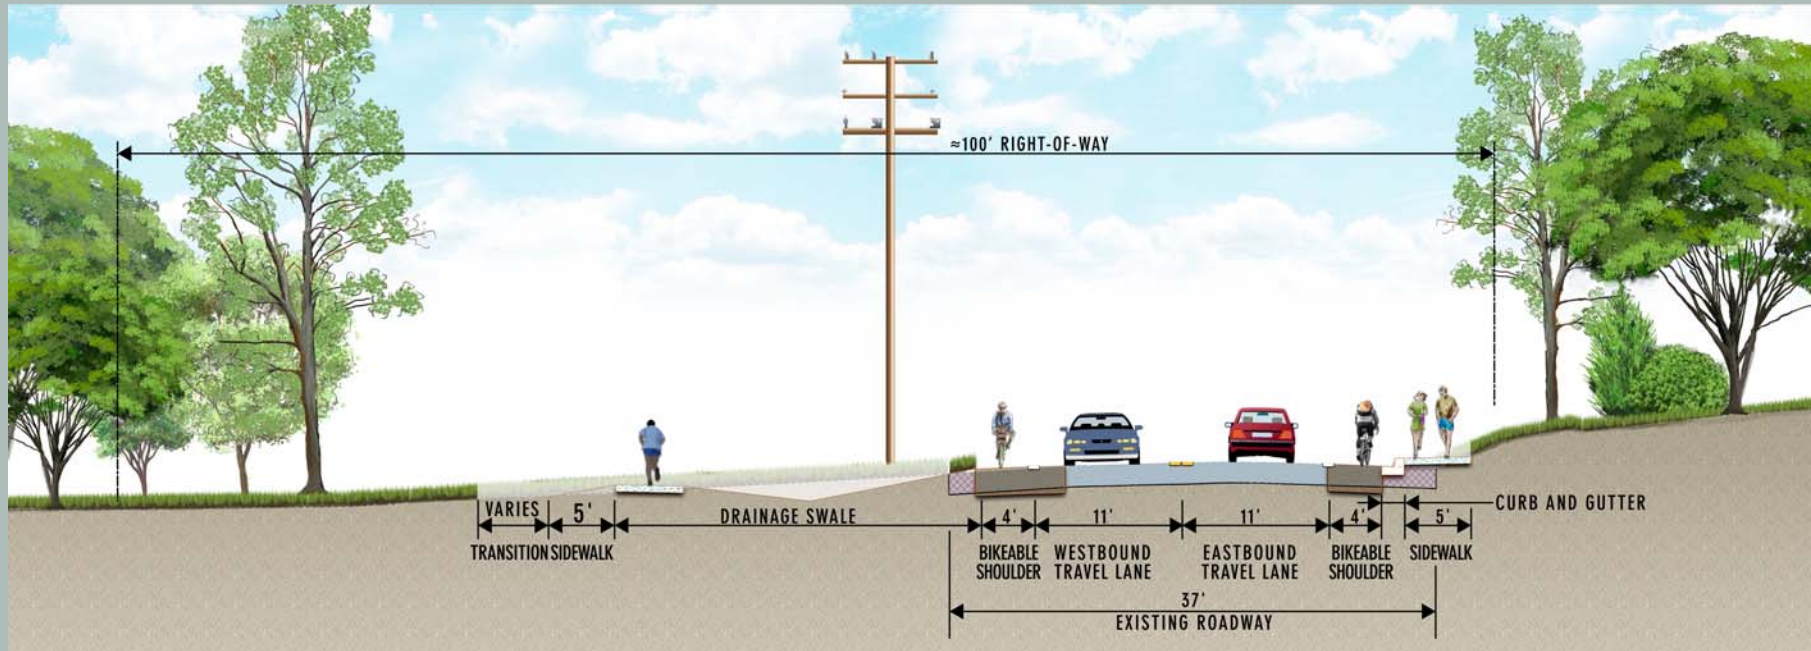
Alternate 4C – Sidewalk North Side Only with Bikeable Shoulders Typical Section Looking East
